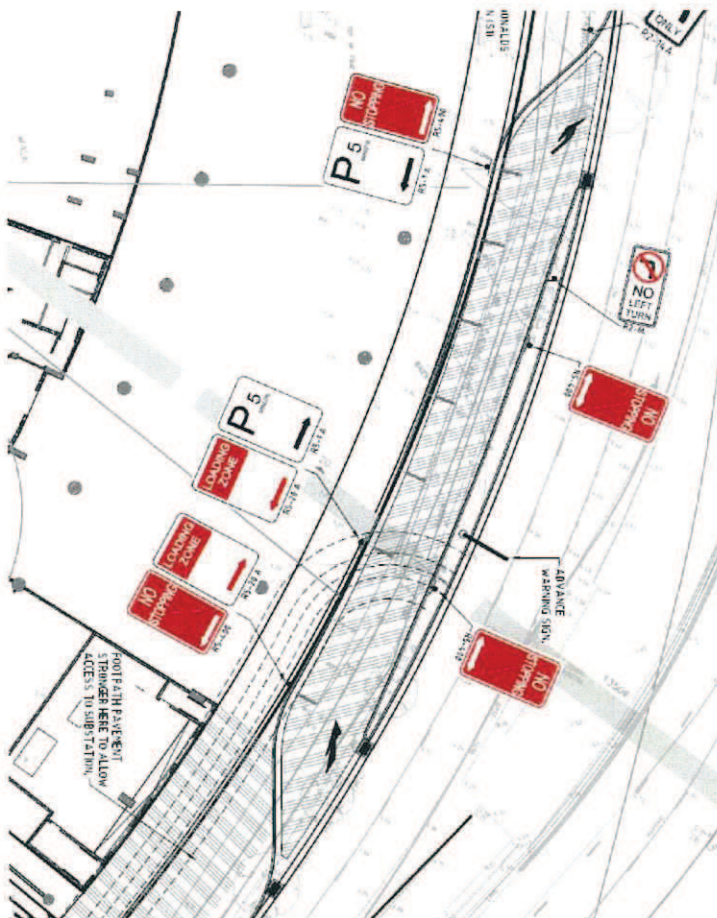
Lengthened pick-up/drop off lane with loading zone
